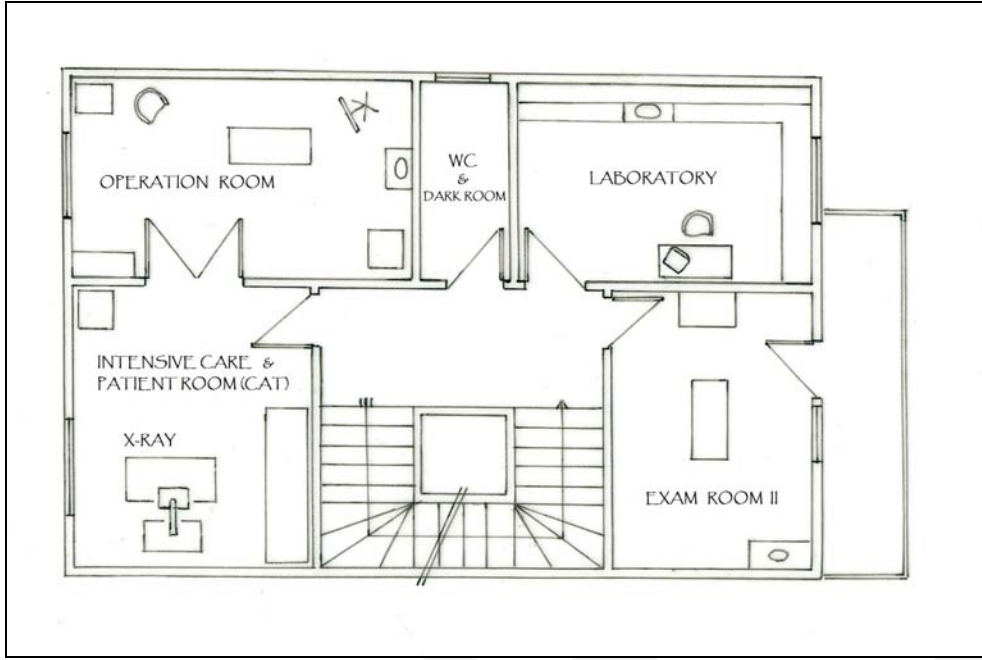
First Floor Plan of Beysukent Veterinary Clinic
